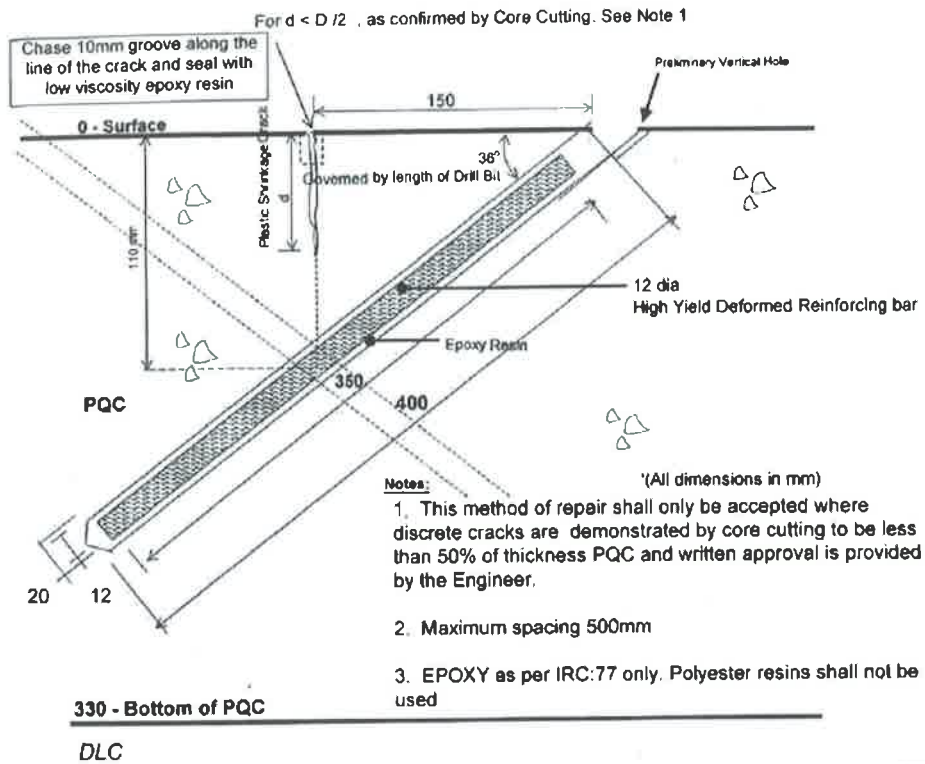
Typical Arrangement for Cross Stitching with 12 mm Dia Straight Bars
